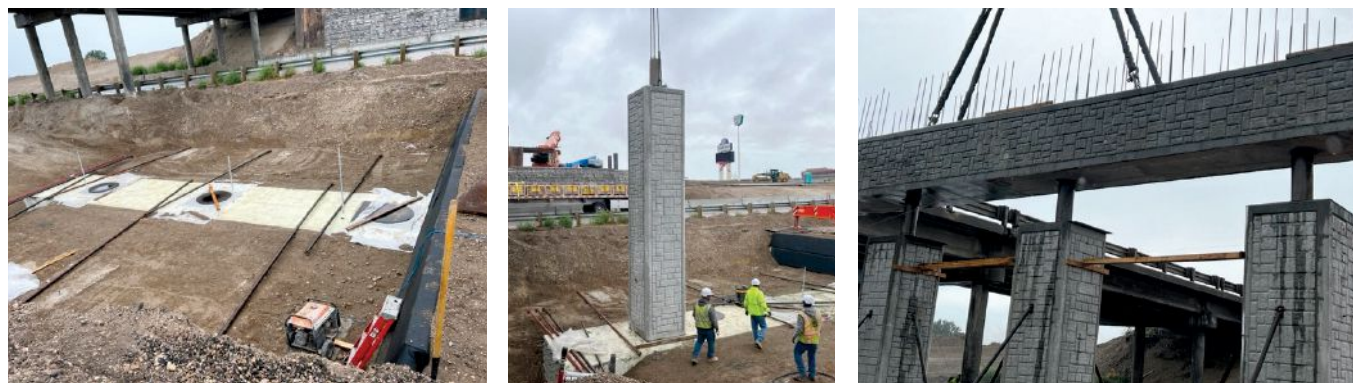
Construction of the Fort Hall Interchange Bridge over Interstate 15 in southeast Idaho. This project introduced seismically resilient precast concrete pier-element connections developed by Idaho State University and the Idaho Transportation Department.
